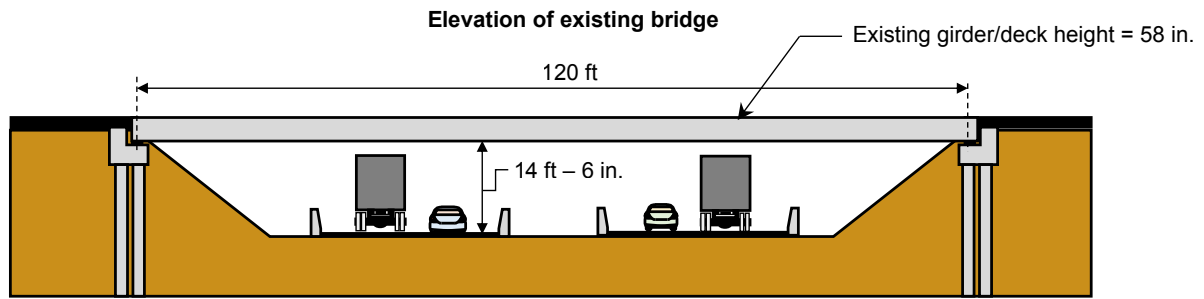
Elevation of the existing bridge replaced in case study 1. Note: 1 in. = 25.4 mm; 1 ft = 0.305 m.
